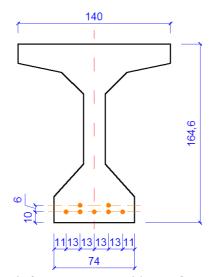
Location of the reinforcements at midspan for each beam (annotations in cm)
